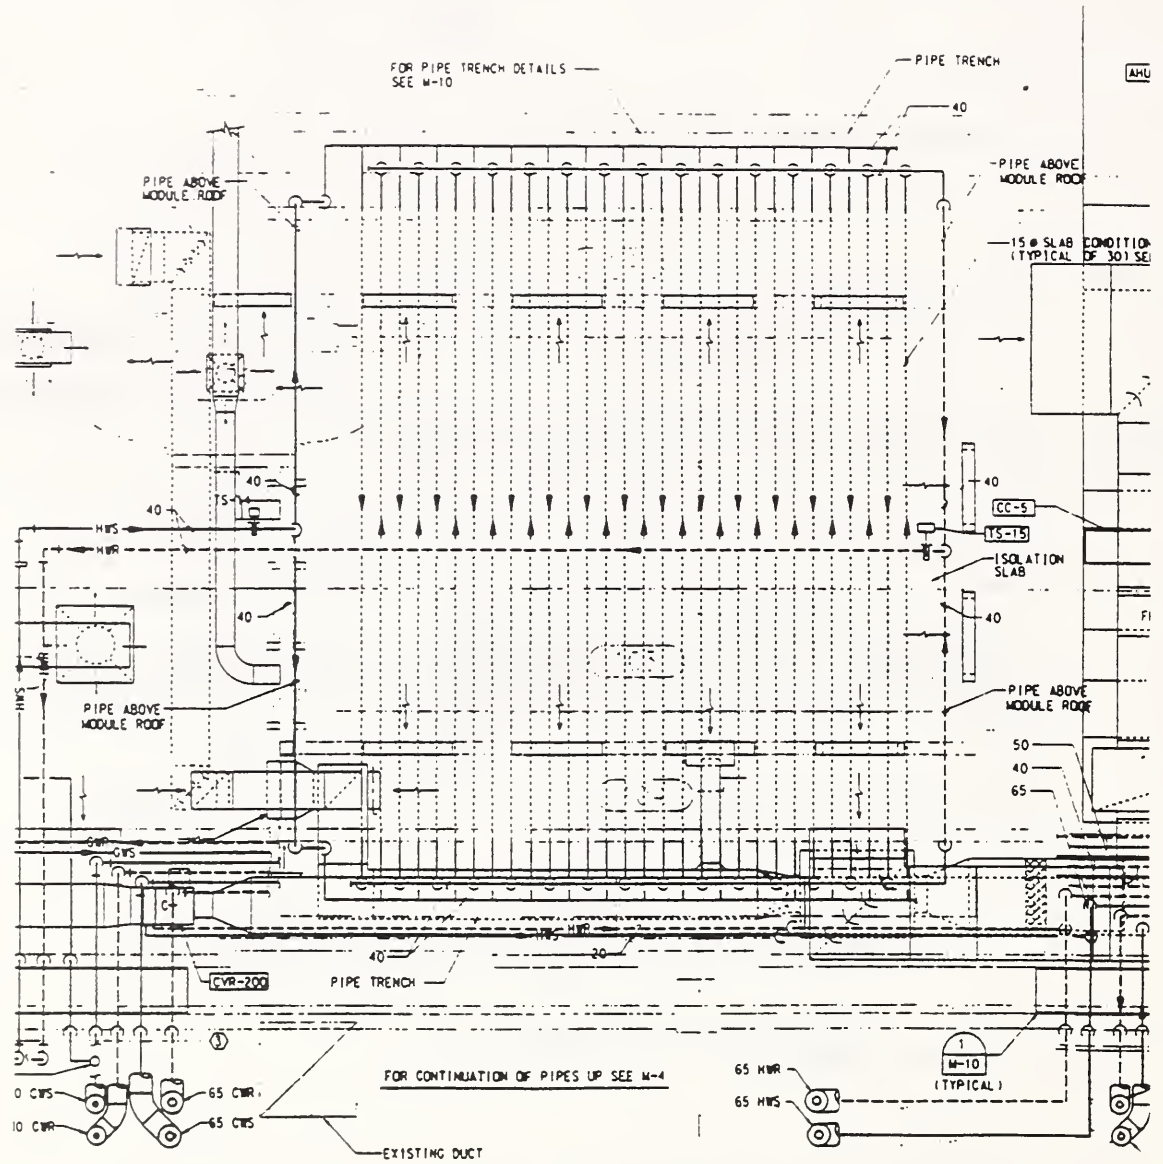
Piping Layout Plan for Isolation Slab Conditioning System
